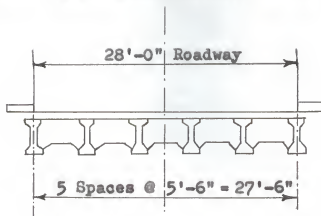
CROSS SECTION OF BRIDGE AT A DIAPHRAGM.
